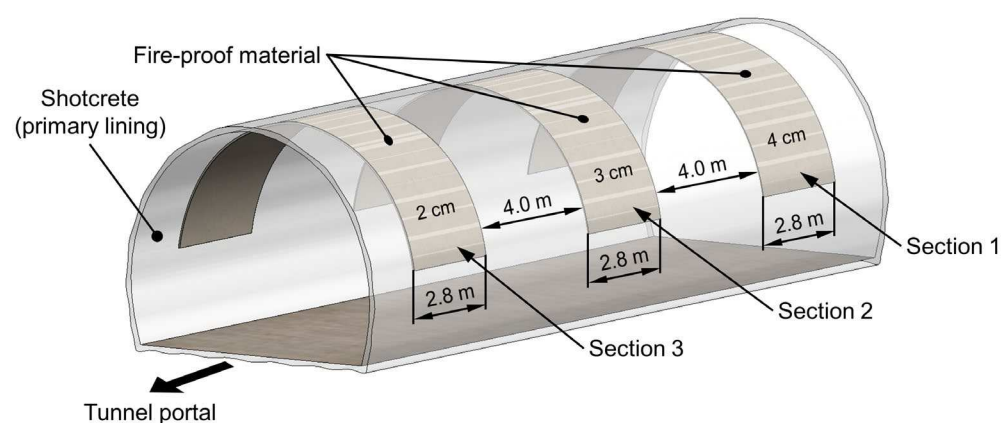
Test section configuration showing the protected tunnel zones used as instrumented measurement locations.
